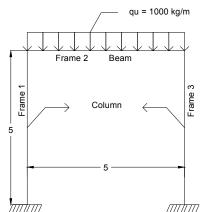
Simple Portal with Two Fixed Restraints and Uniform Load on Beam
